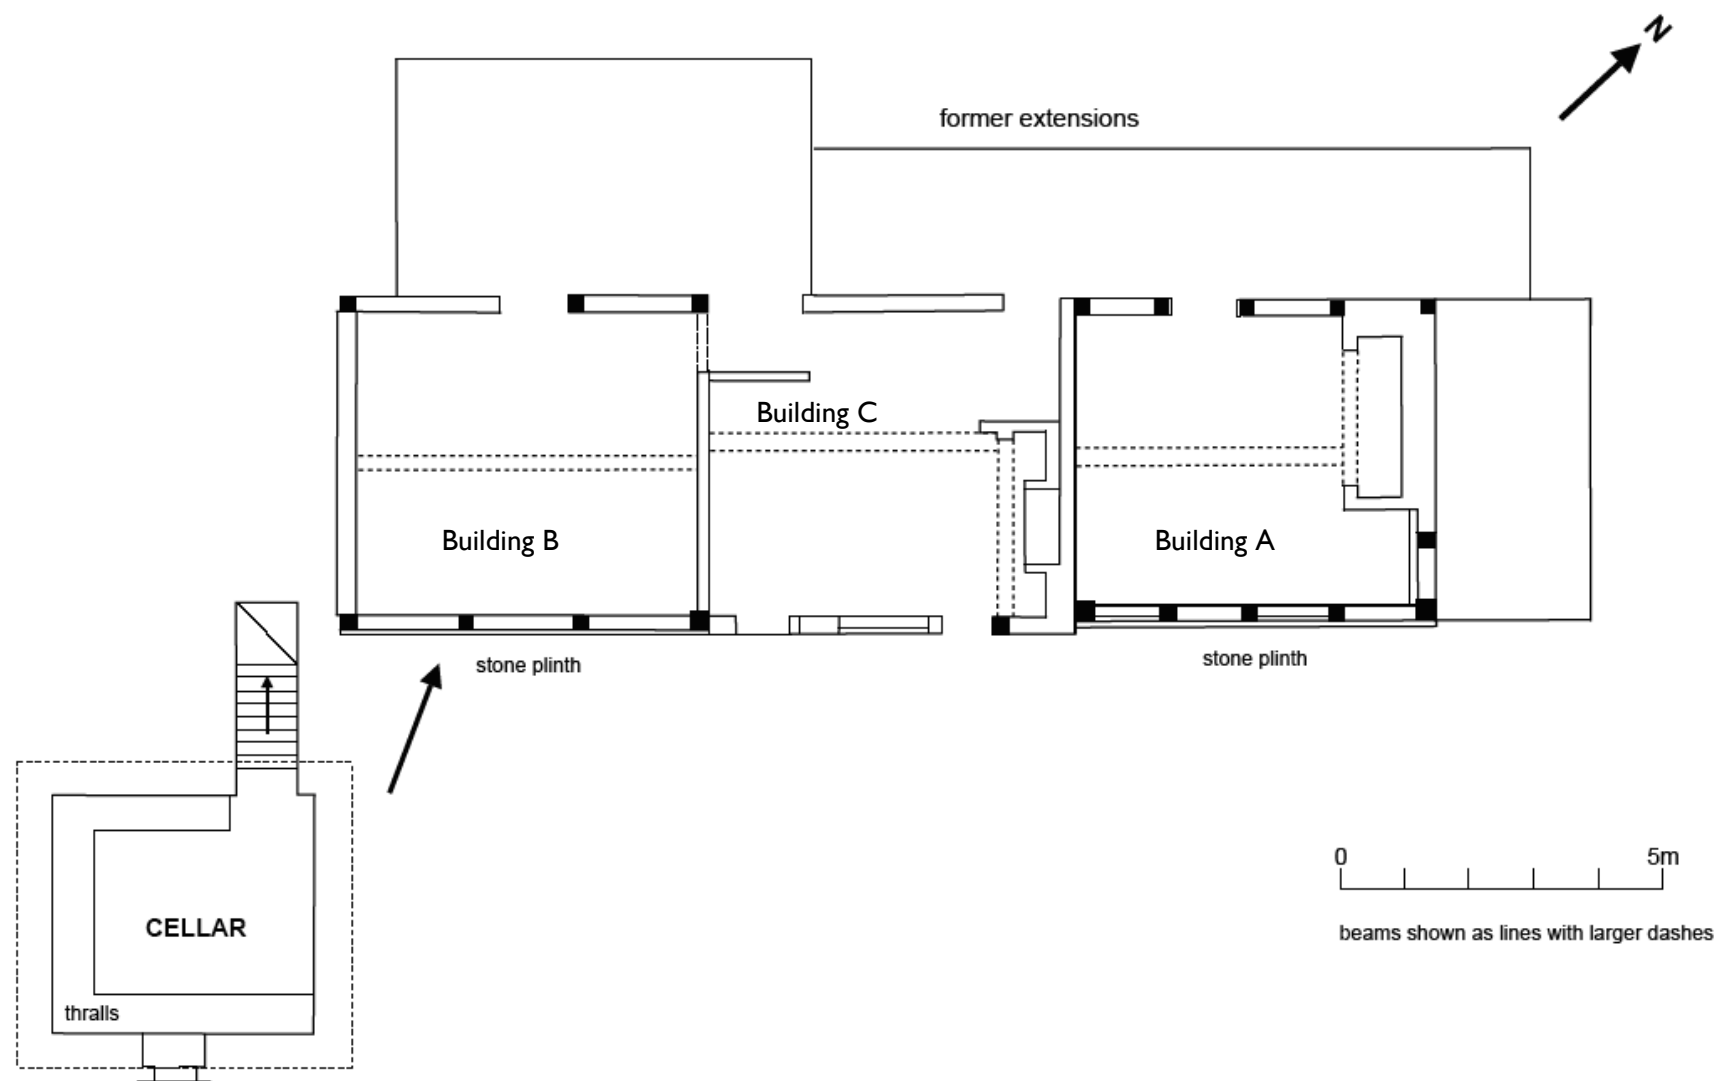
Church Farm House; ground plan and cellar plan (Richard Sheppard)
